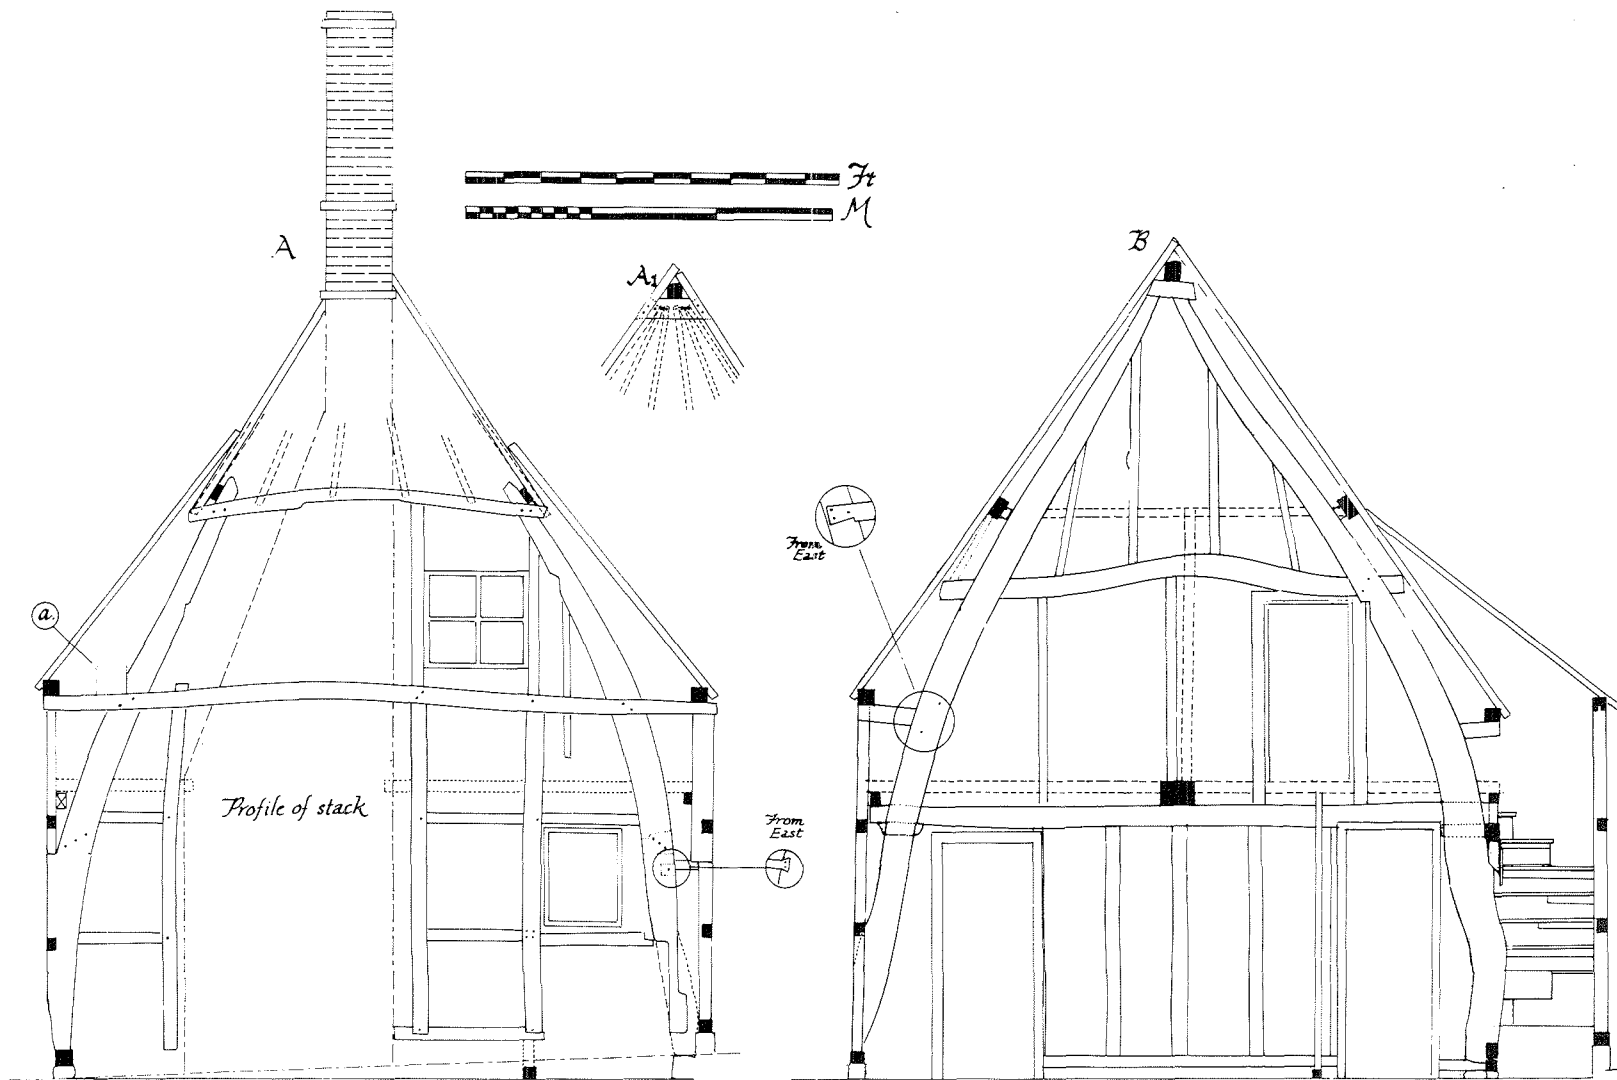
Left: Elevation of western gable (Truss A). Right: Section at B. Inset: Section at A1, showing hip. All looking E.
